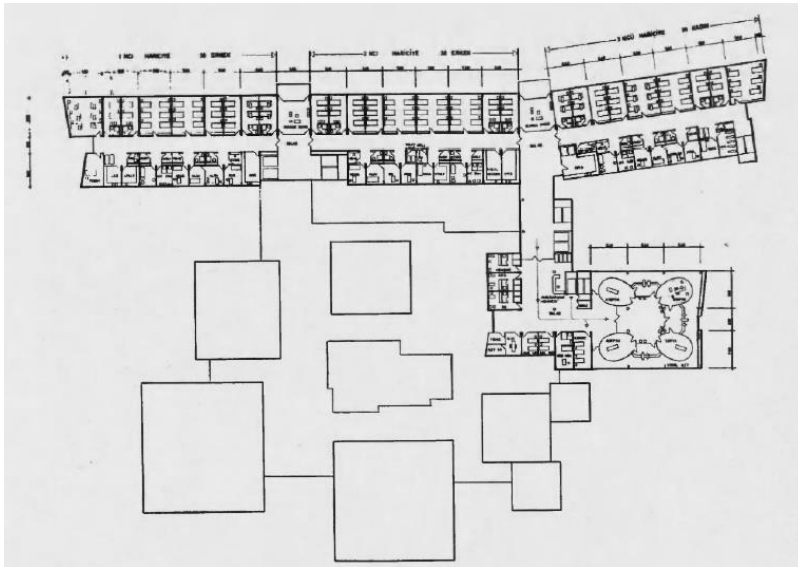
First Floor Plan, Social Insurance Institution Beyoğlu Hospital
